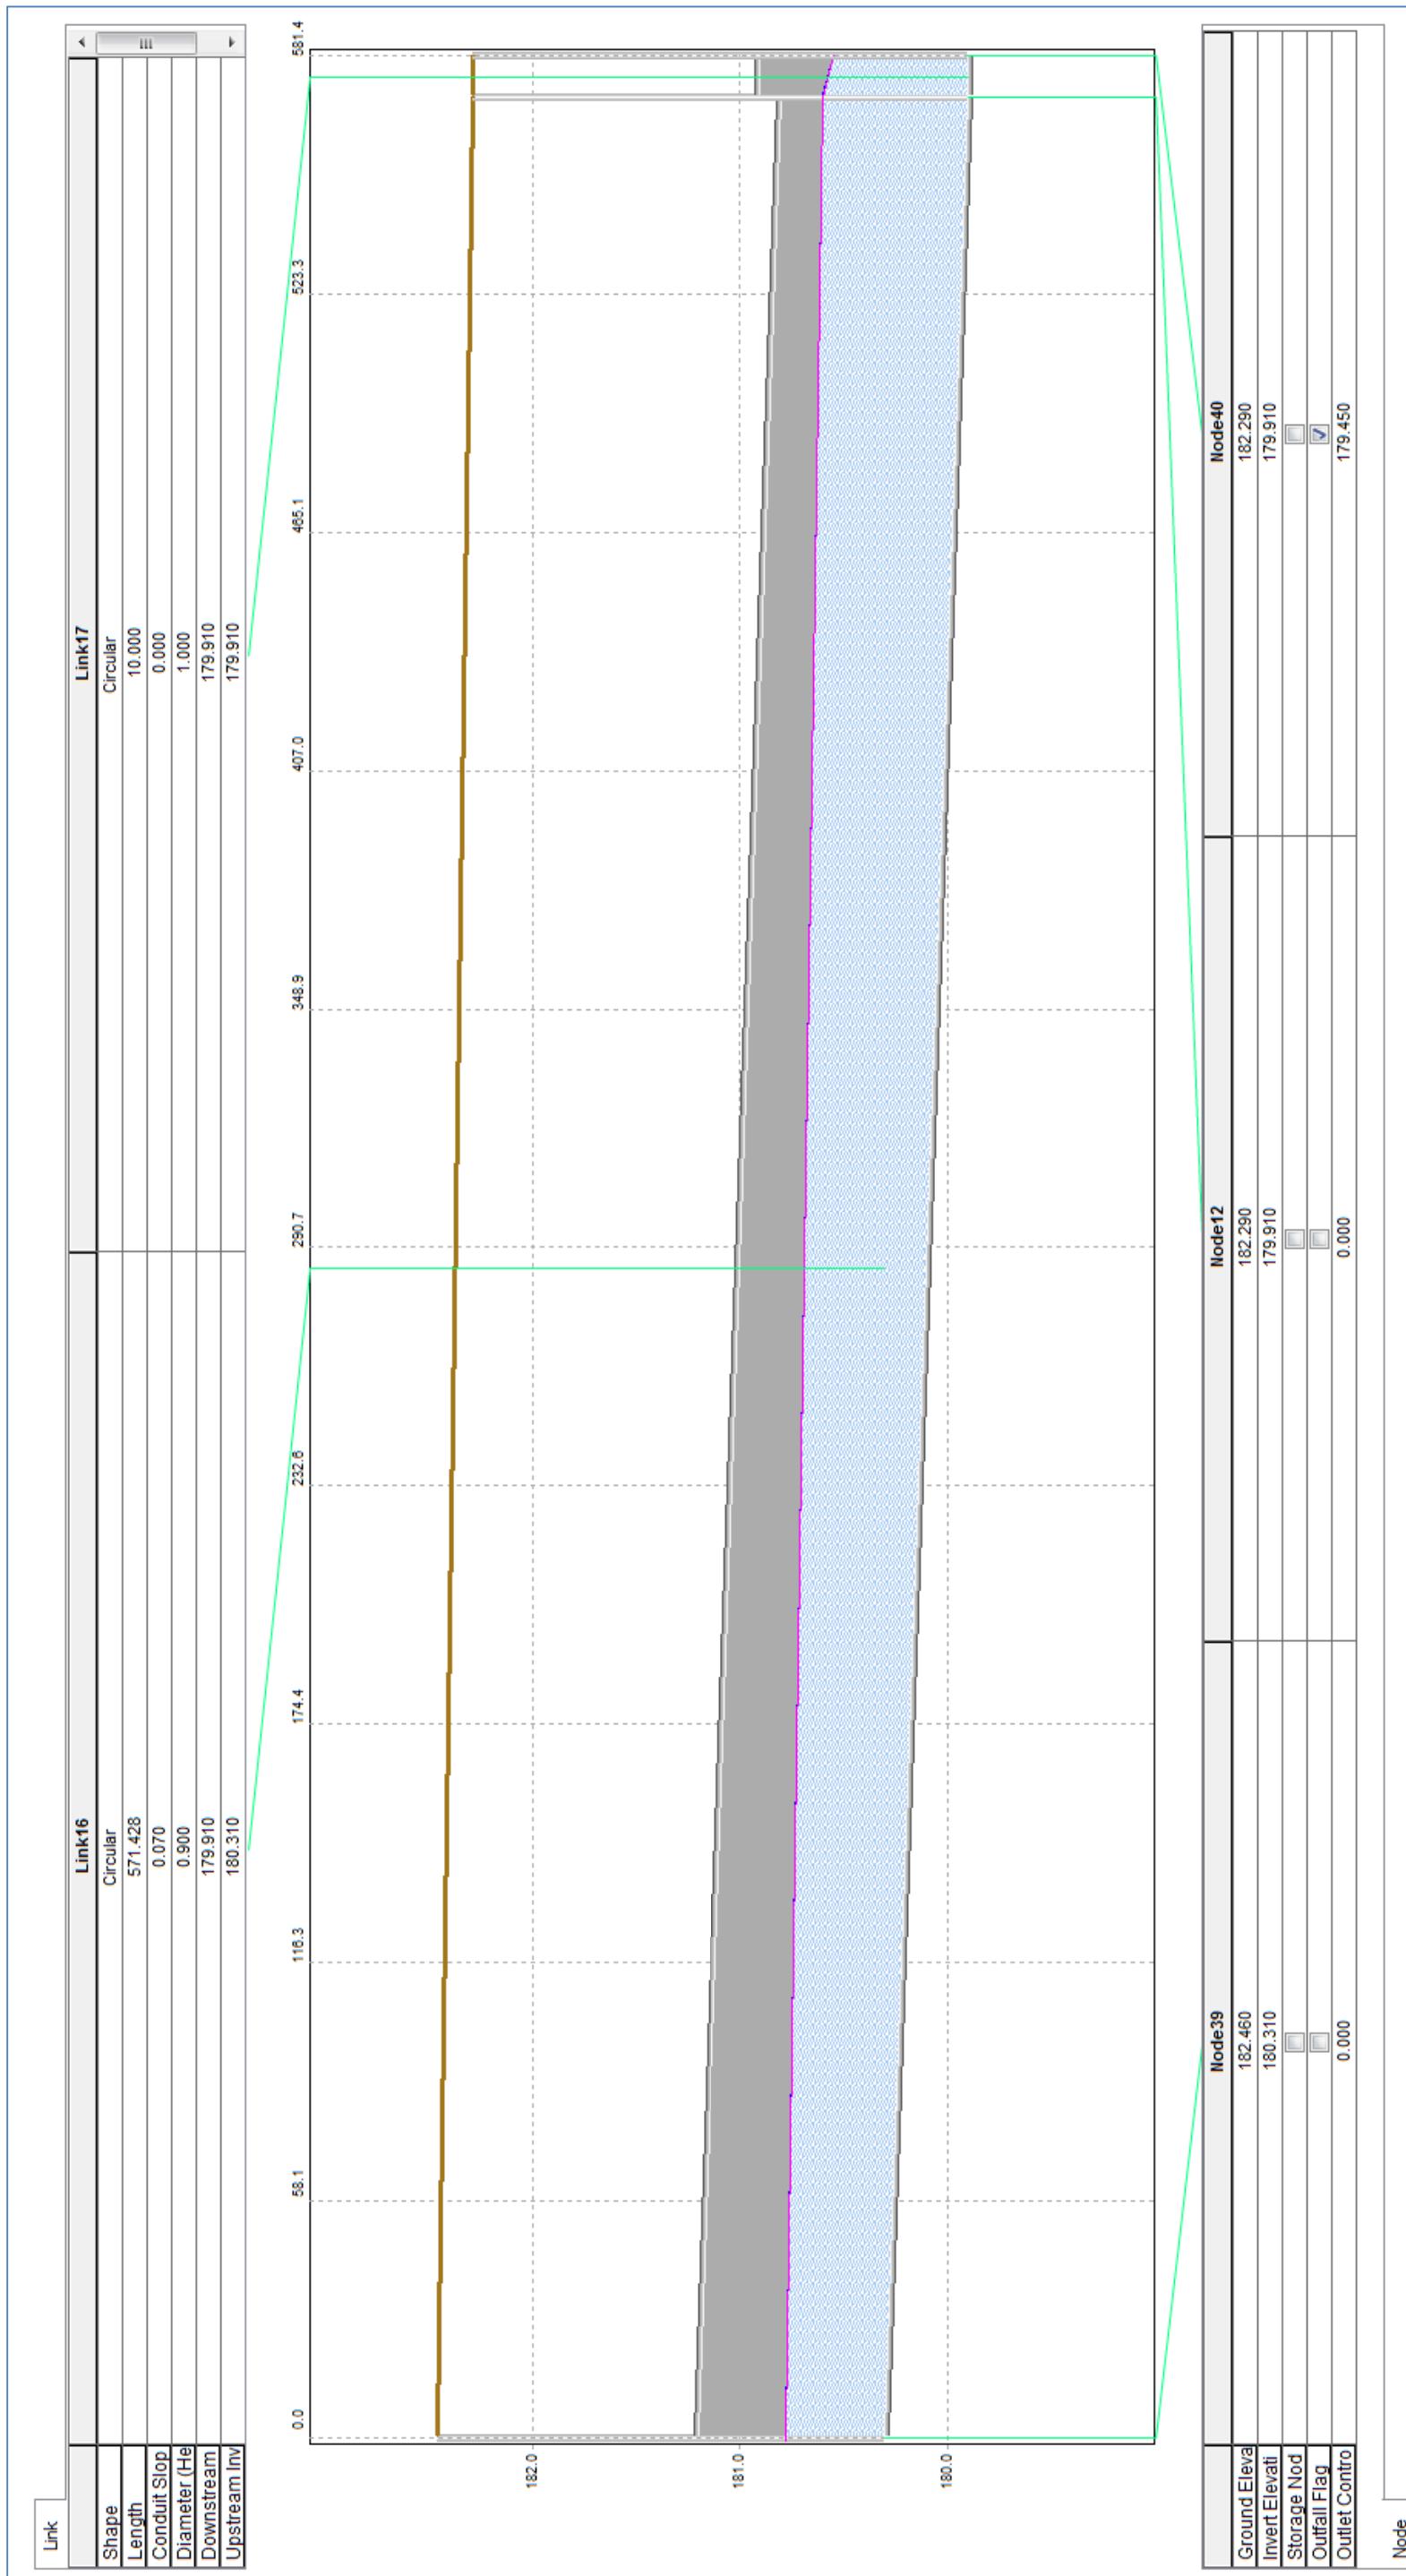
Lauzon Parkway Extension (Sta. 12+370 - 12+670) - Permanent Pool Elevation Backwater Condition
